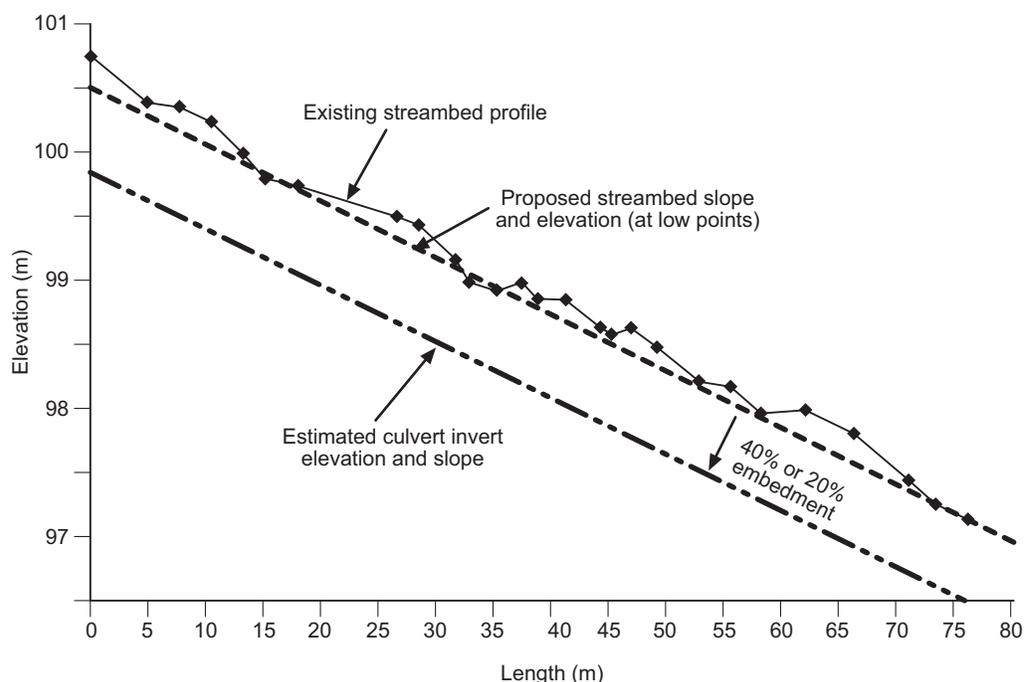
Stream elevation profile example for use in determining culvert slope and minimum invert level for an embedded culvert.
